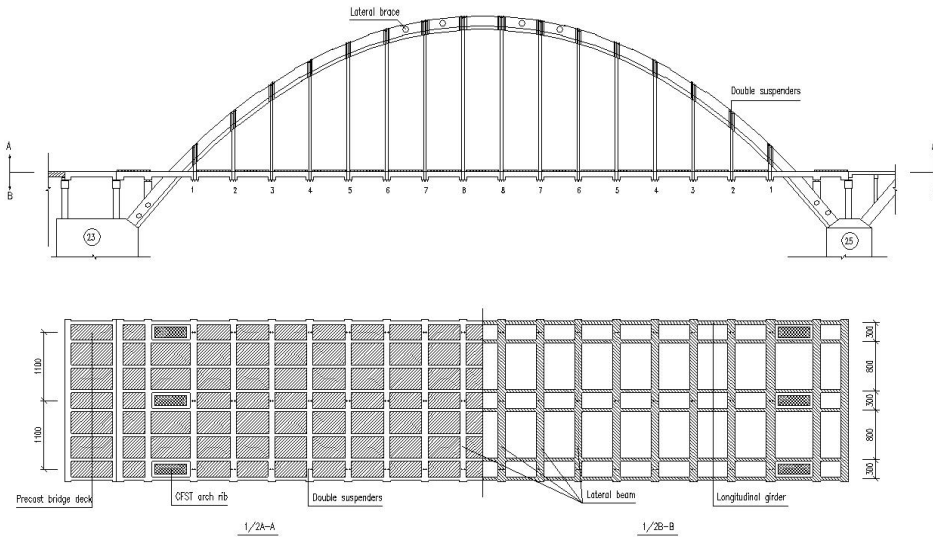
Longitudinal girders and lateral beams frame (unit: cm).
